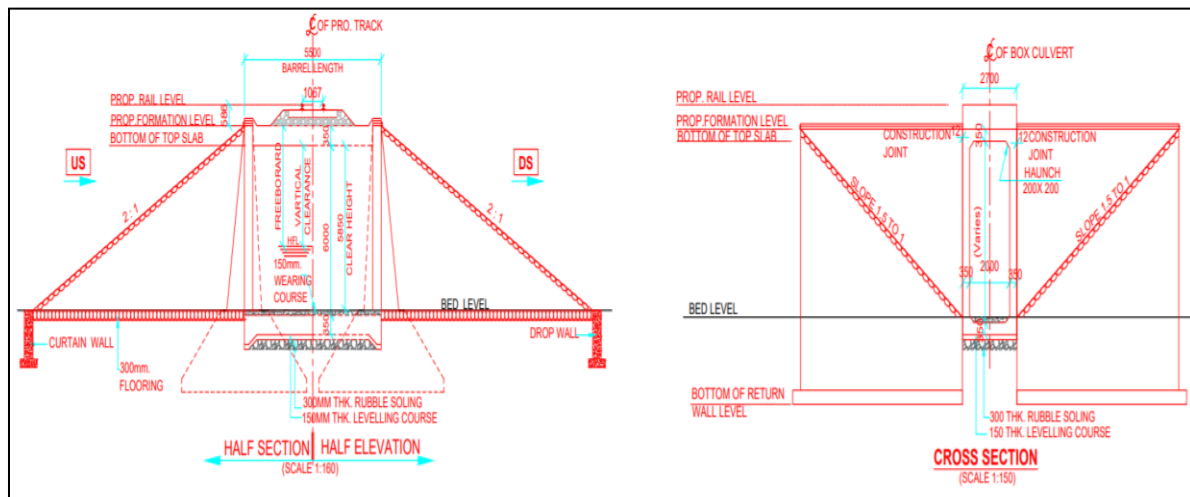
Typical GAD of 1 X 4 Box Culvert for Minor Bridge
